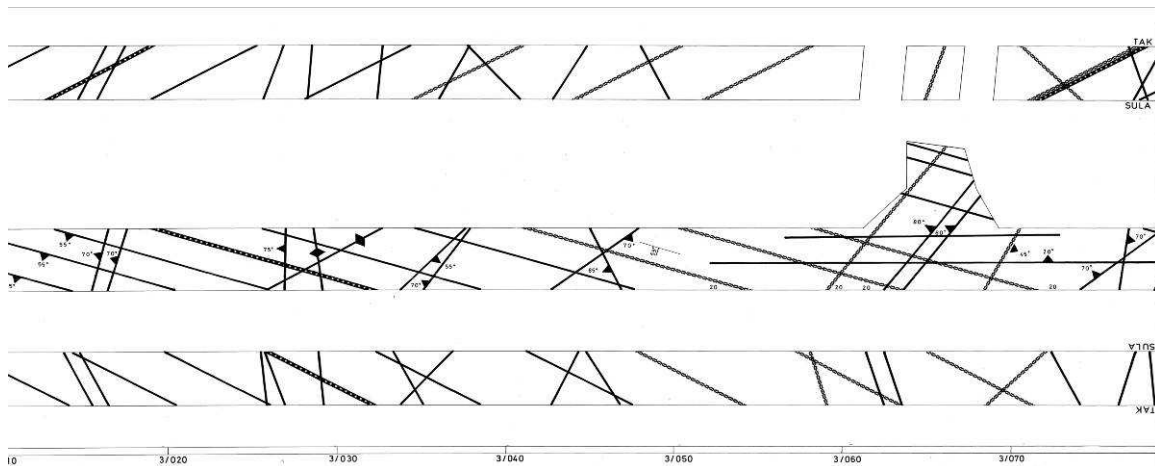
An example on construction document as show pre-grouting and reduced tunnel excavation in difficult passages
